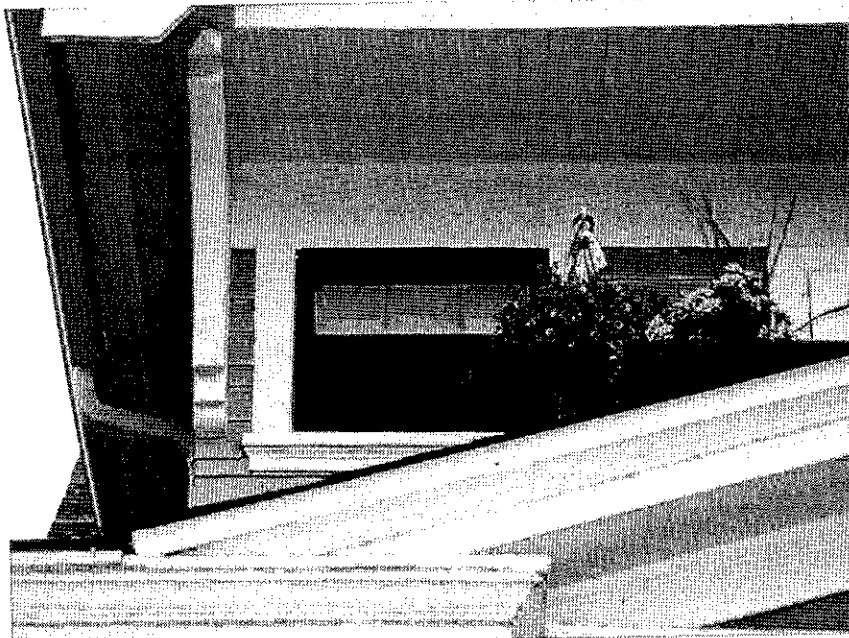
Front (east) bay windows. Windows to be restored at this location.
